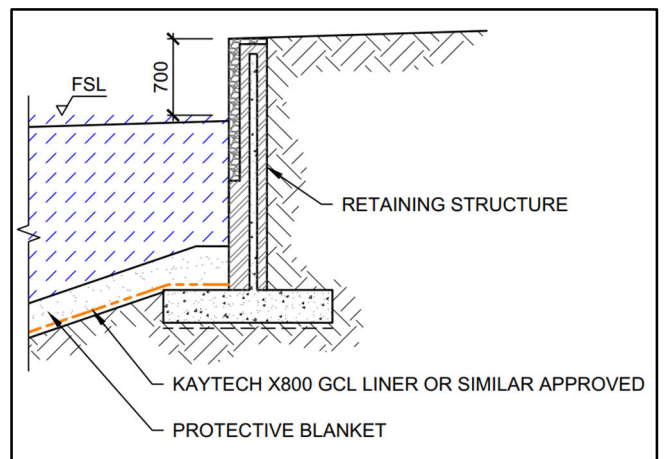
Dam at the 5th tees typical details of the retaining wall
